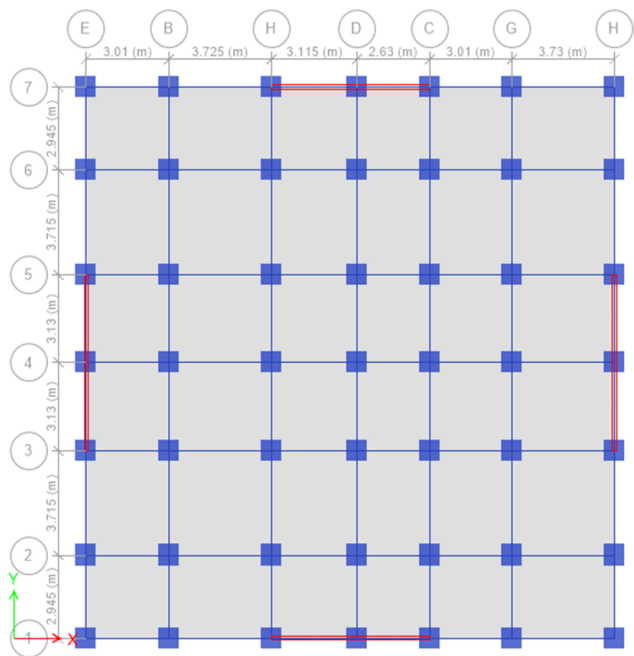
Ground Floor and Typical Floor Plan with shear wall
